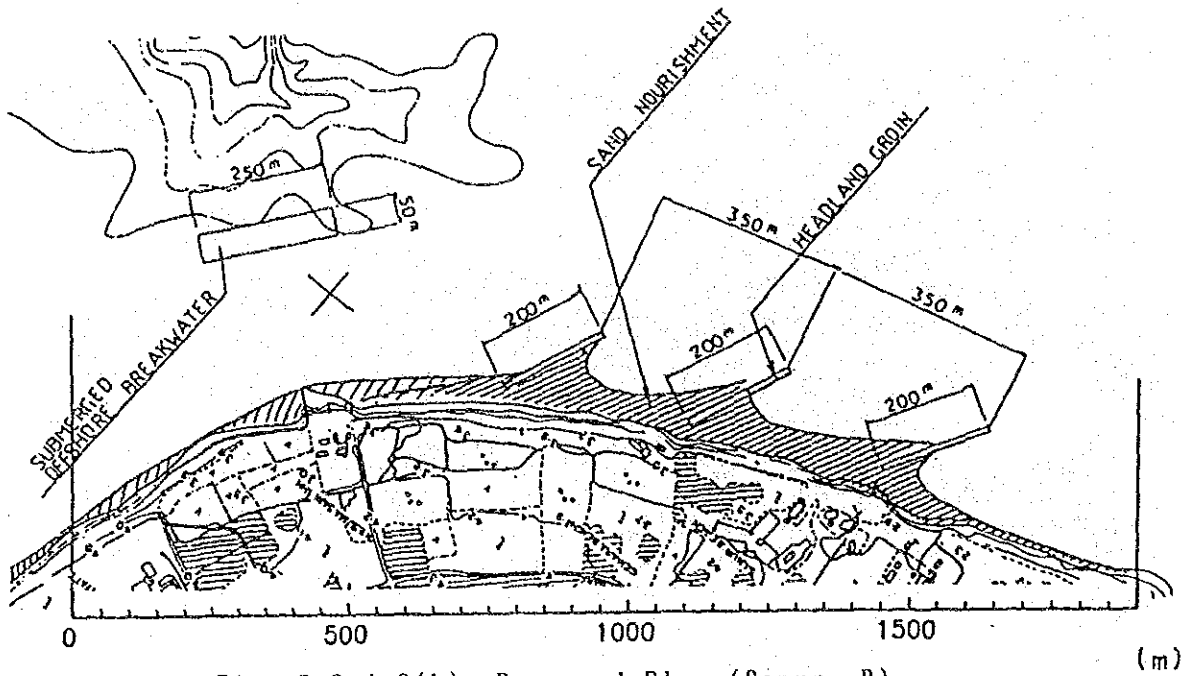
(b) Proposed Plan (Sanur, B)
